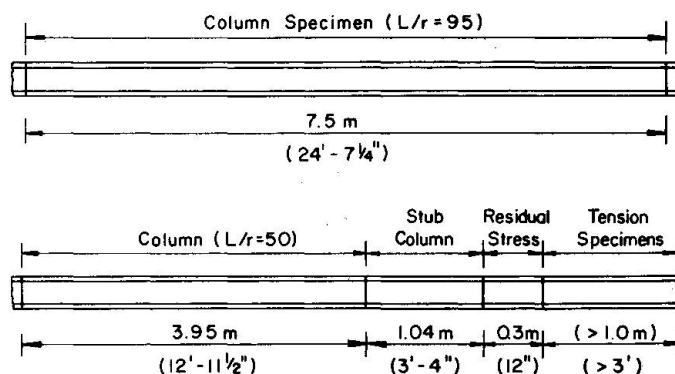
Schematic Layout of Test Specimen from Each Rolling
